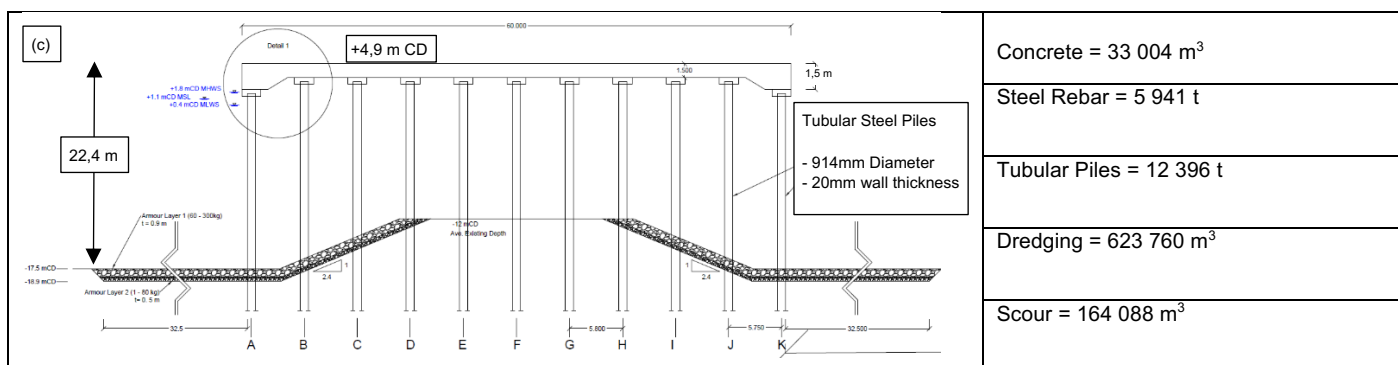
Typical cross sections of open pile suspended deck with main material quantities
